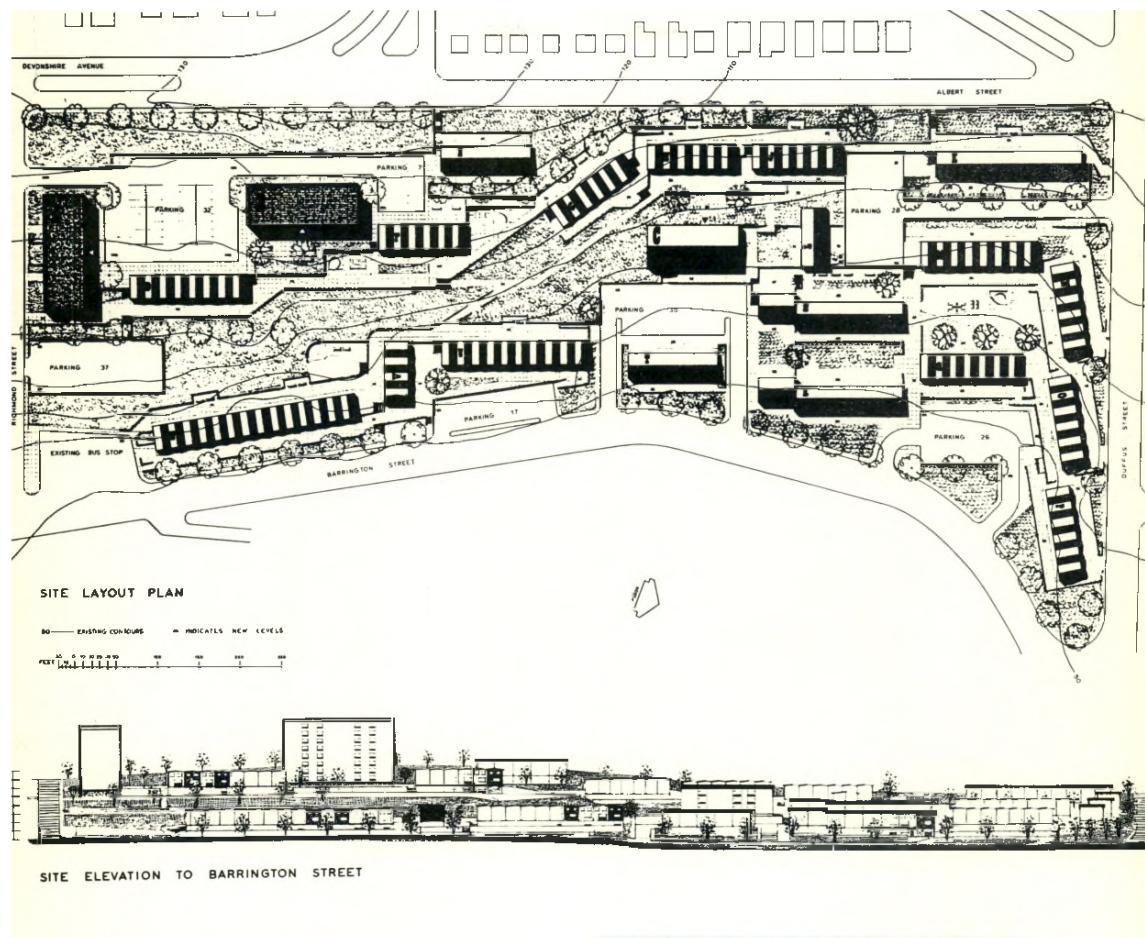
Original site plan and elevation. Source: CMHC (1959)
